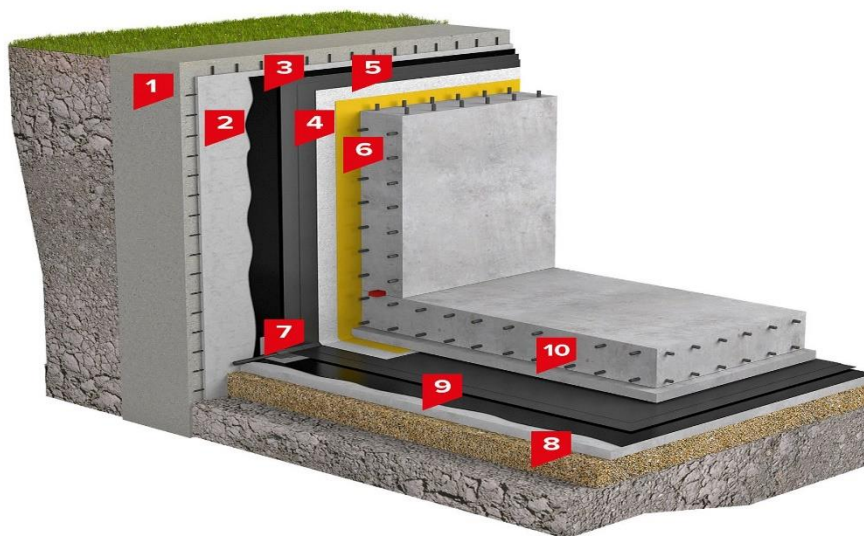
Laying the material on a concrete base (concrete preparation B10) under the foundation slab
